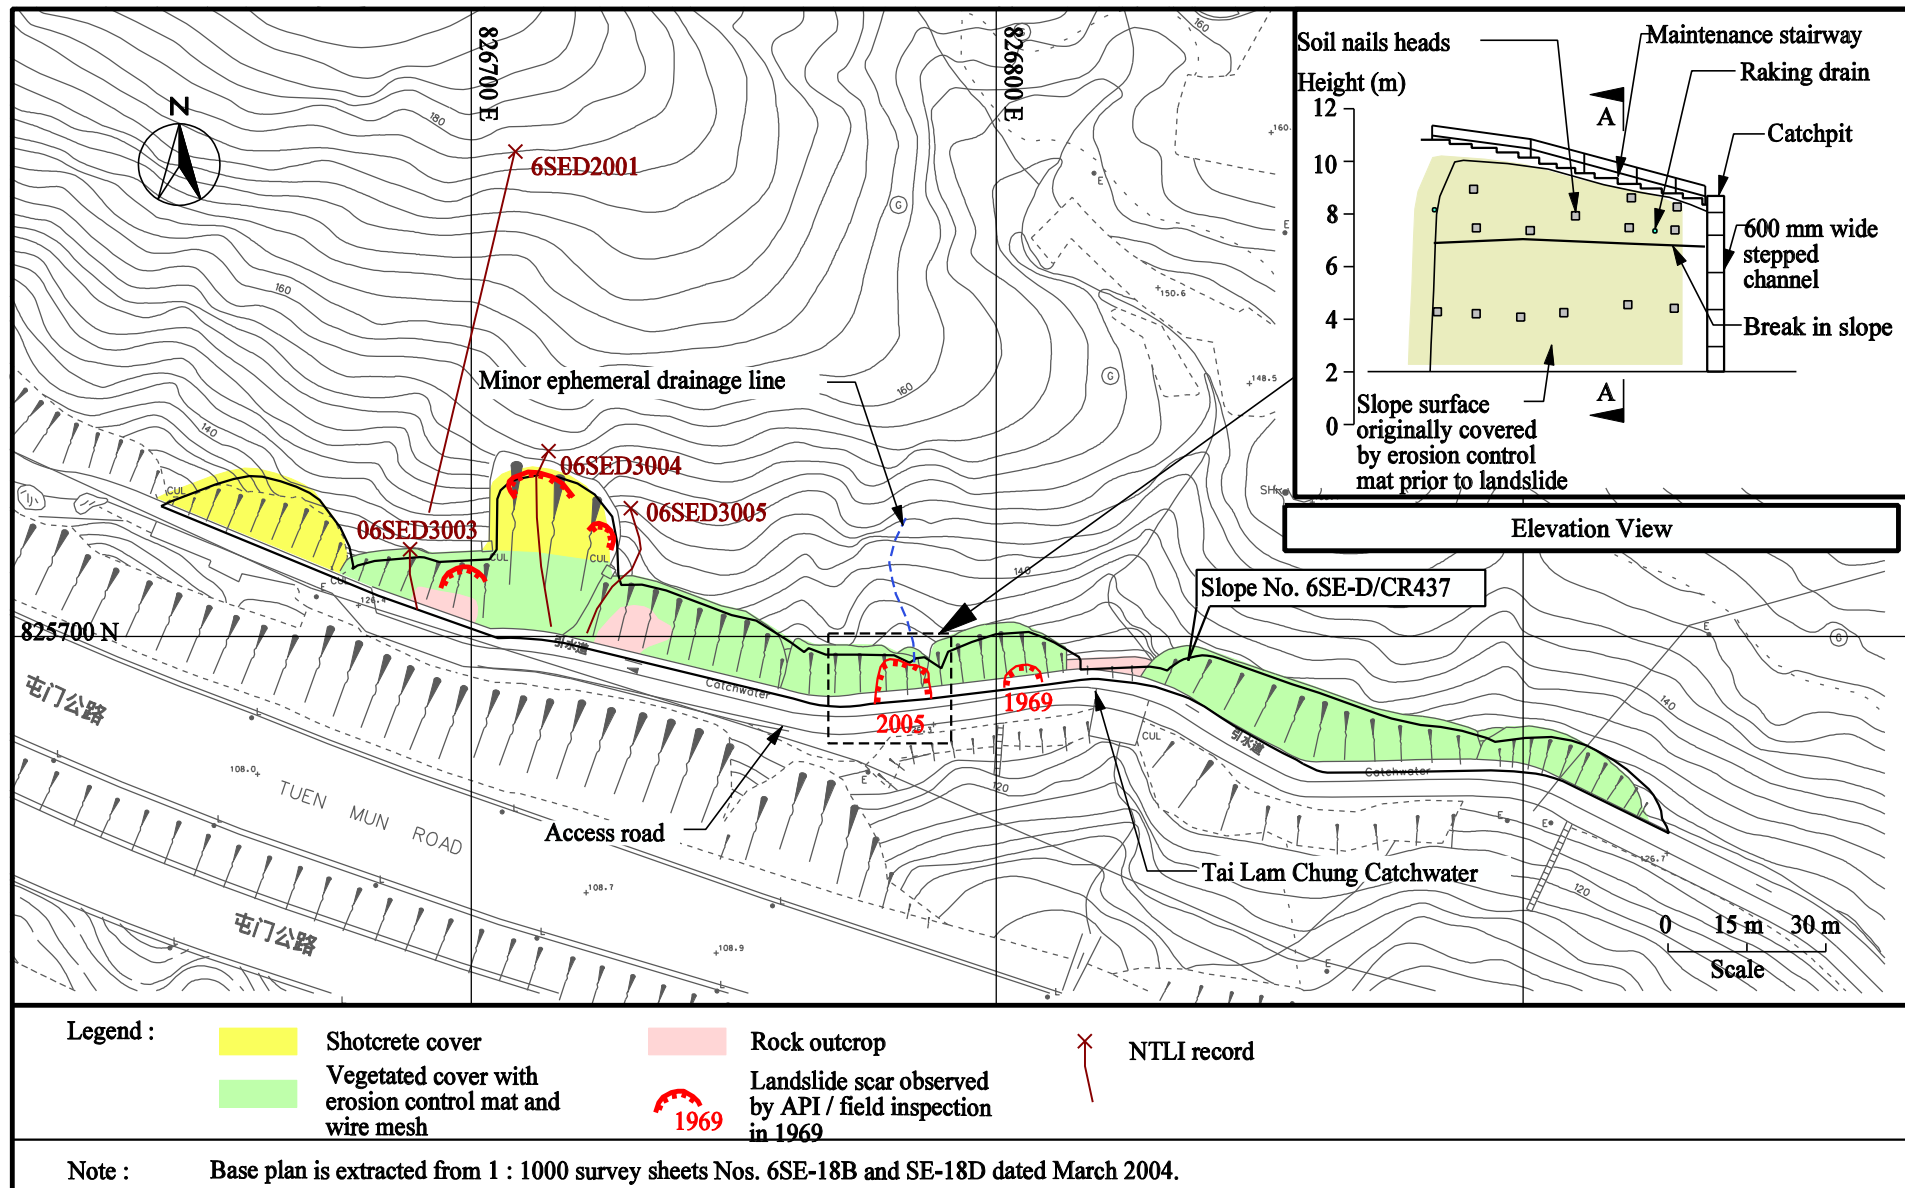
Site Plan (Slope No. 6SE-D/CR437)
